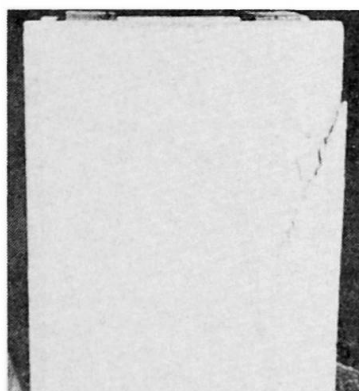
Final failure by cracking of concrete edge for no. 5
